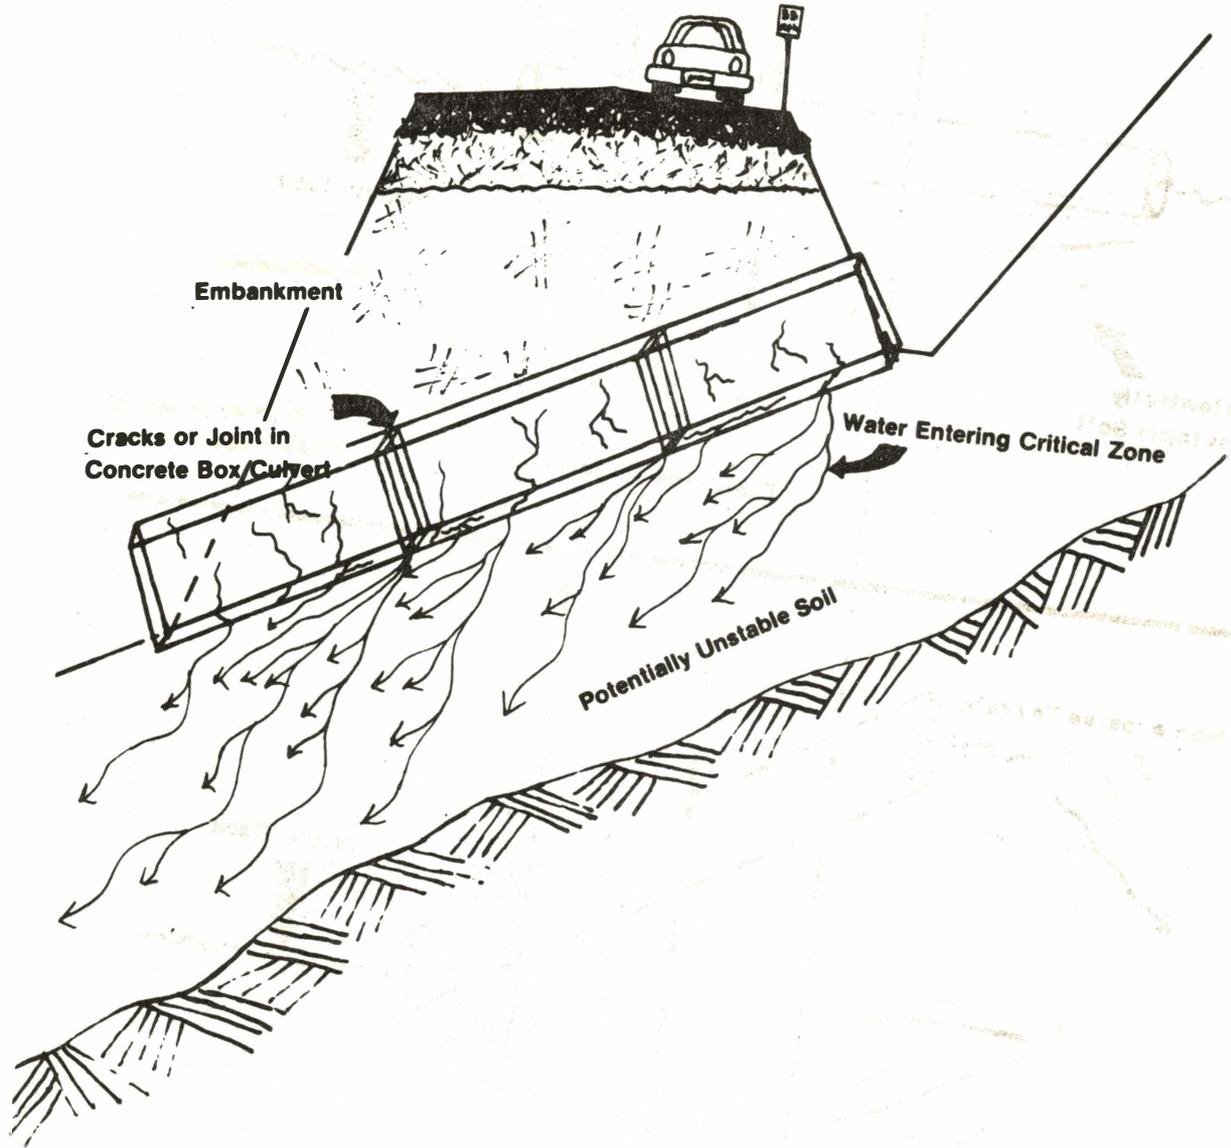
Leaks in cracks and joints of a concrete box culvert.
